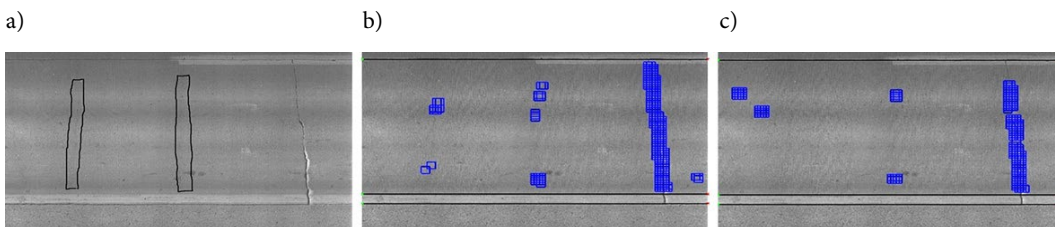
An example of combined low and high severity PCC pavement crack detection: a – actual image; b – shape-based crack detection; c – SVM based crack detection
